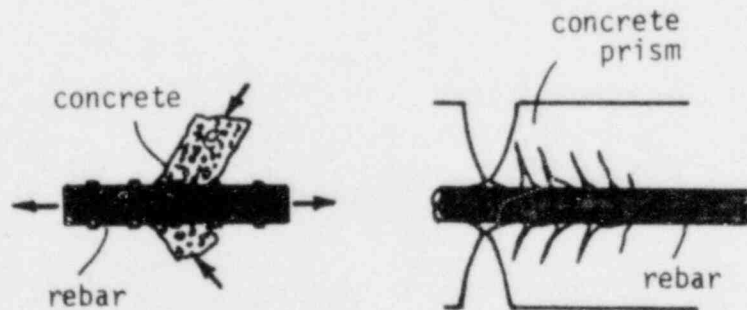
Wedging action and internal cracking of an axially tensioned concrete prism reinforced with a single bar.
